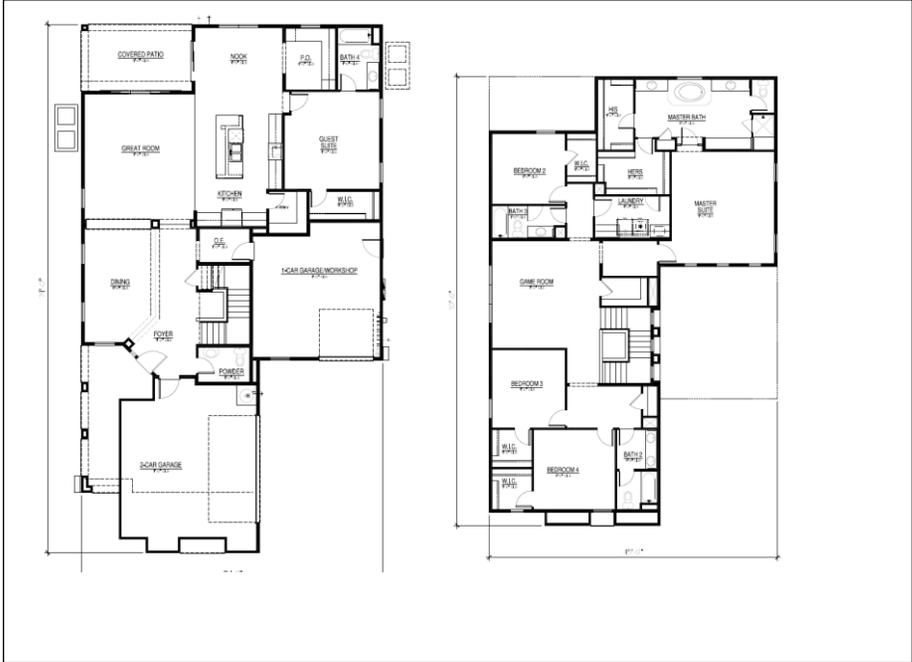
Exhibit A – Housing Product, The Seven Plans with Three Elevations (Spanish Colonial, Ranch Territorial, and Craftsman)
